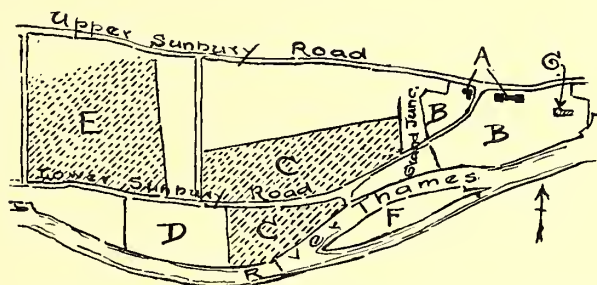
GENERAL PLAN OF THE STATION AT HAMPTON.
